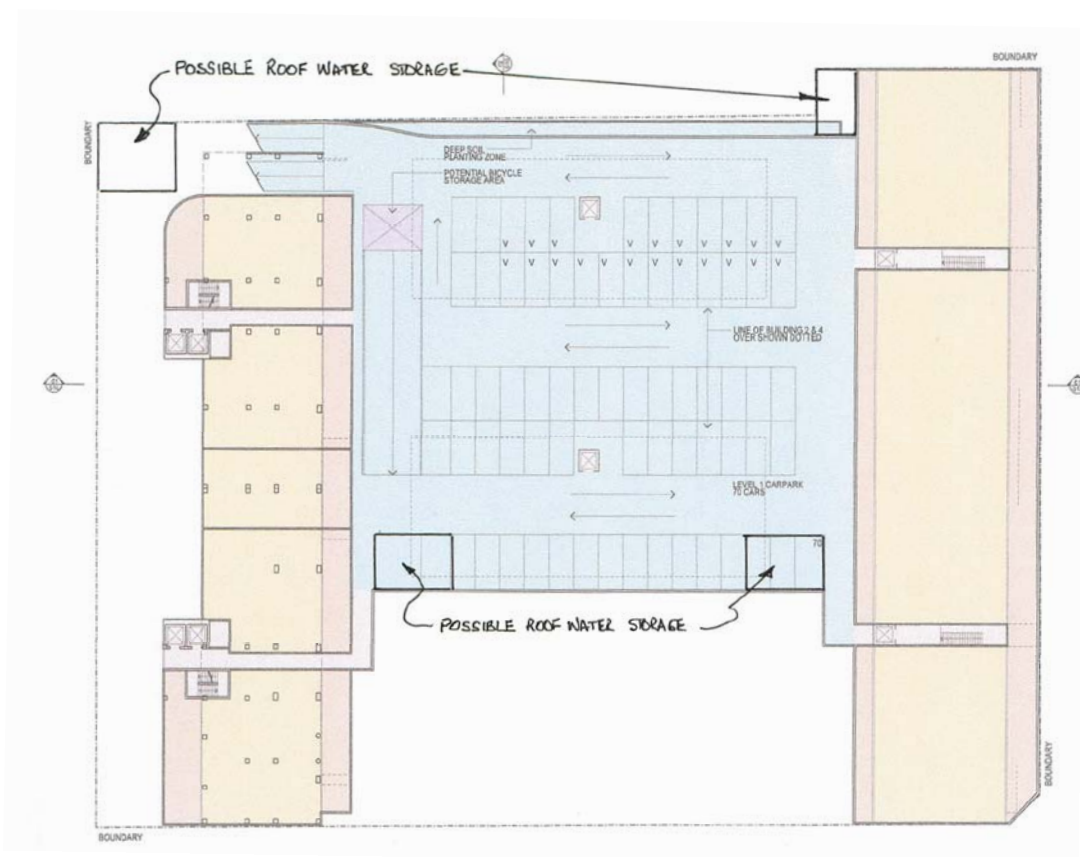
Possible location within the basement parking level for roof rainwater storage and re-use.
